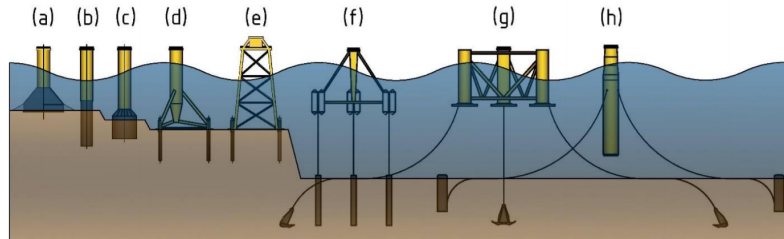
Common types of foundations used to support WTGs; (a) Gravity-base (b) Monopile (c) Suction caisson (d) Tripod substructure supported by three driven piles (e) Jacket substructure supported by four driven piles (f) Tension leg platform (TLP) anchored to three driven piles (g) Drag anchors (h) Ballast-stabilised floating spar platform anchored to three suction caissons (Bhattacharya et al. (2017))
